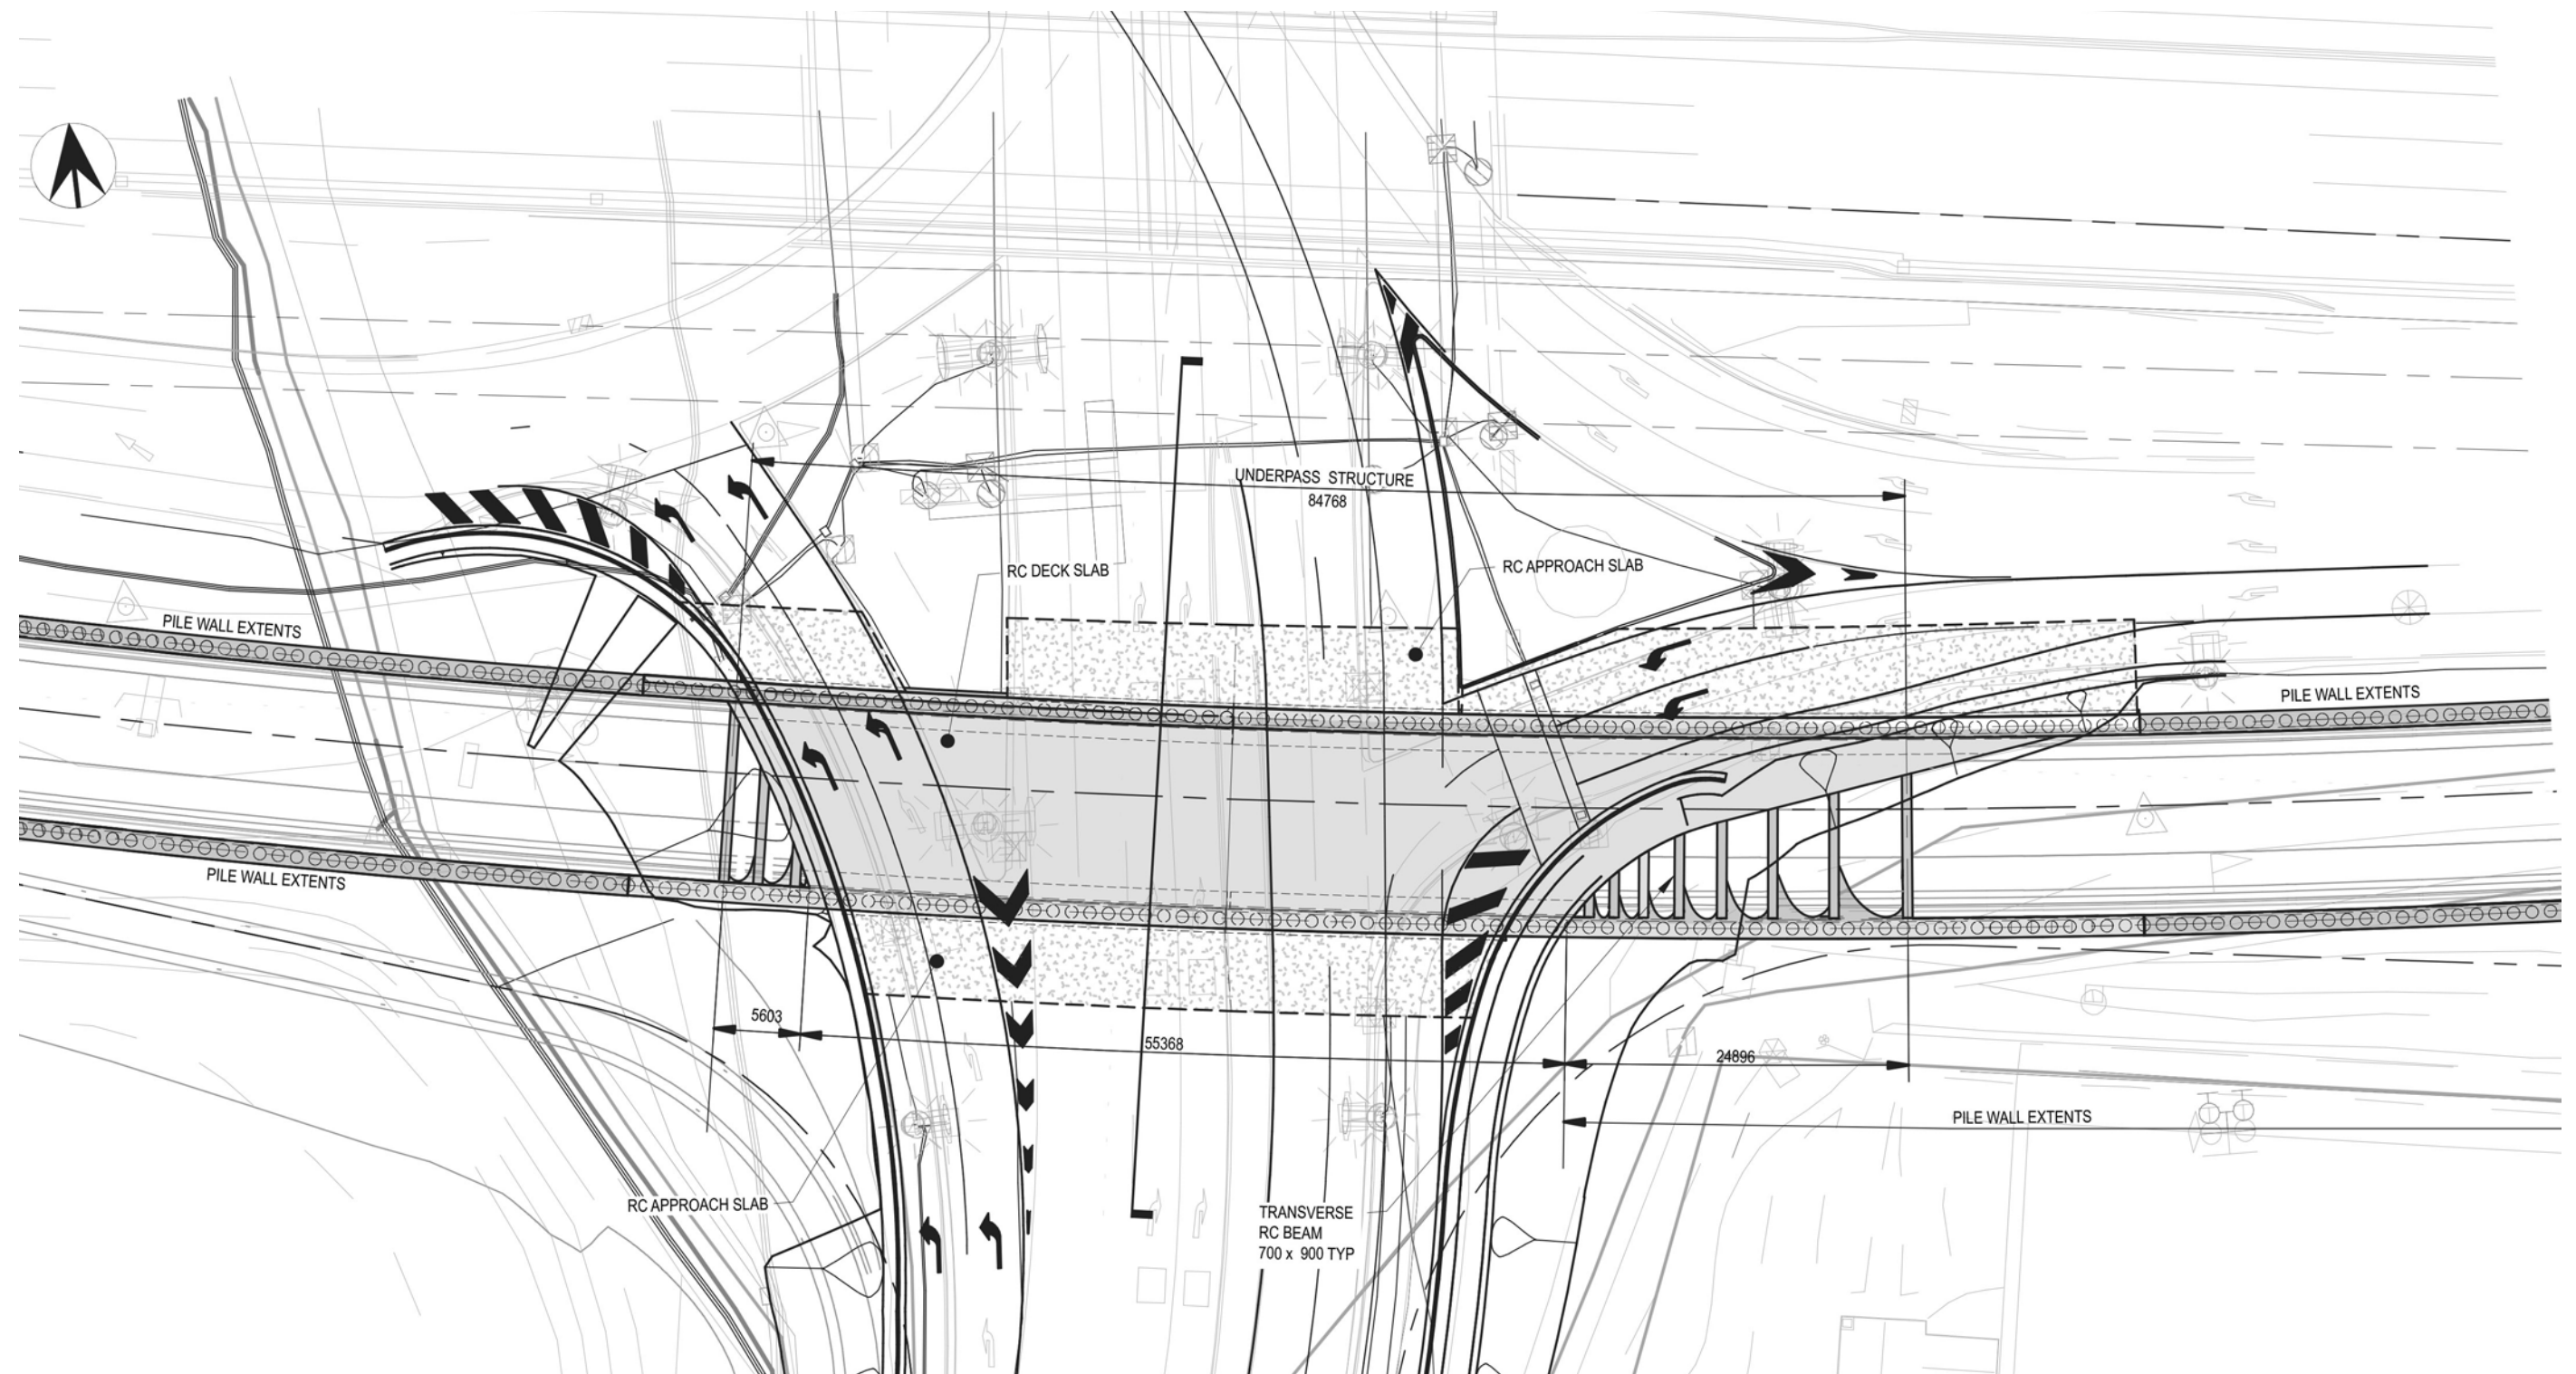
Plan of the proposed underpass at Moorebank Avenue. Scale 1:500
